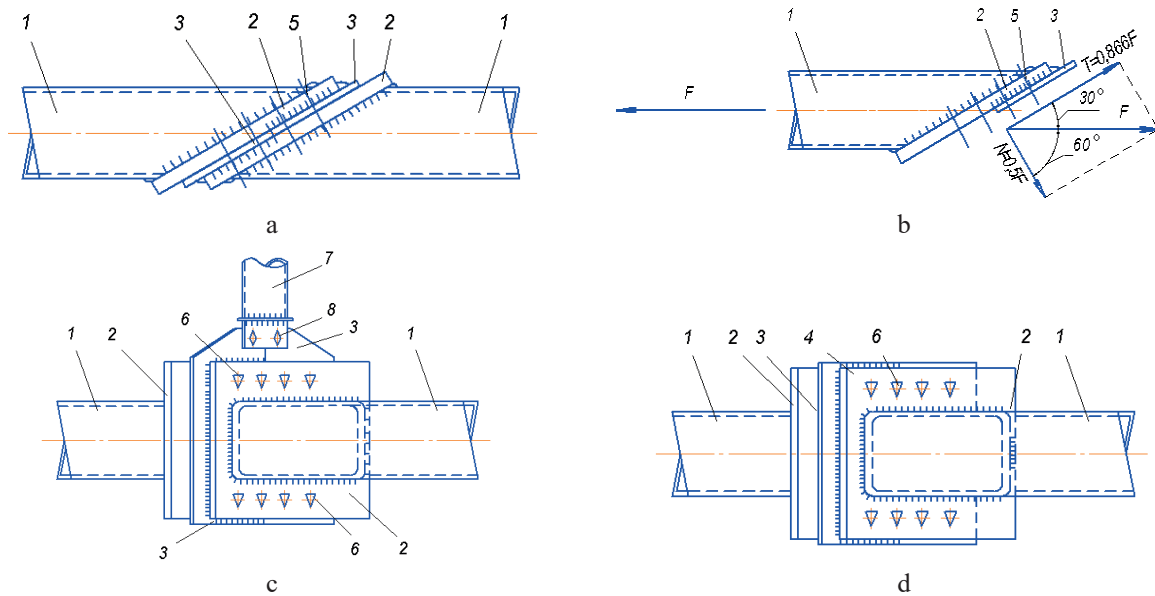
Schemes of flange connections of rectangular closed bent-welded profiles: a - top view; b - design diagram of an element with an oblique flange and a support table; c - side view; d - side view in the absence of lattice rod elements; 1 - lower (stretched) truss belt; 2 - oblique flange; 3 - support table; 4 - protruding part of the flange in the outer zone of the profile; 5 - bolt hole; 6 - coupling bolt; 7 - rod element of the lattice; 8 - bolted fastening of the lattice element; F is the longitudinal tensile force; N is the normal component; T - tangential (tangential) component
